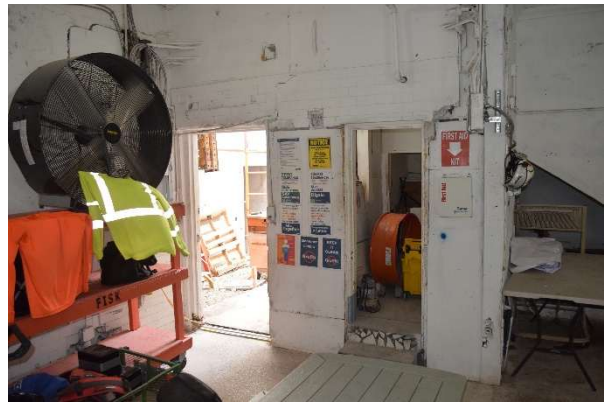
Detail of closet and exterior door off former Mercantile space, November 2025.
